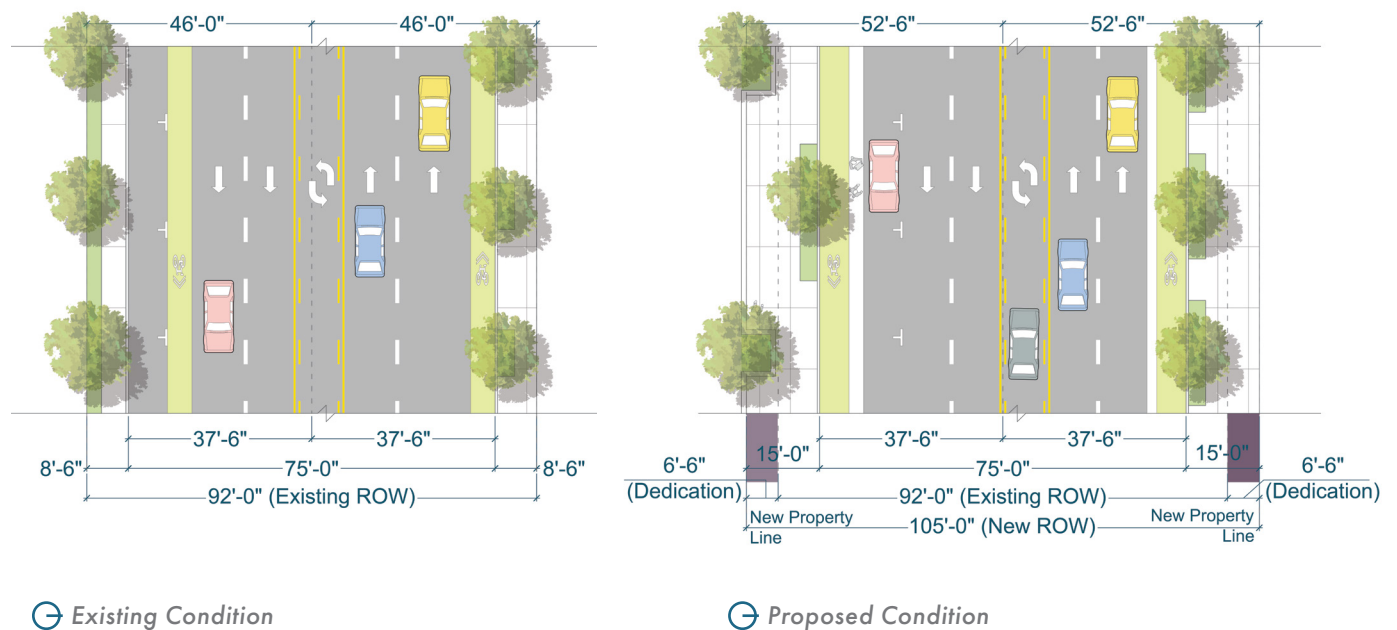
Hannum Avenue Right-of-Way Design (Slauson Avenue to Buckingham Parkway)
